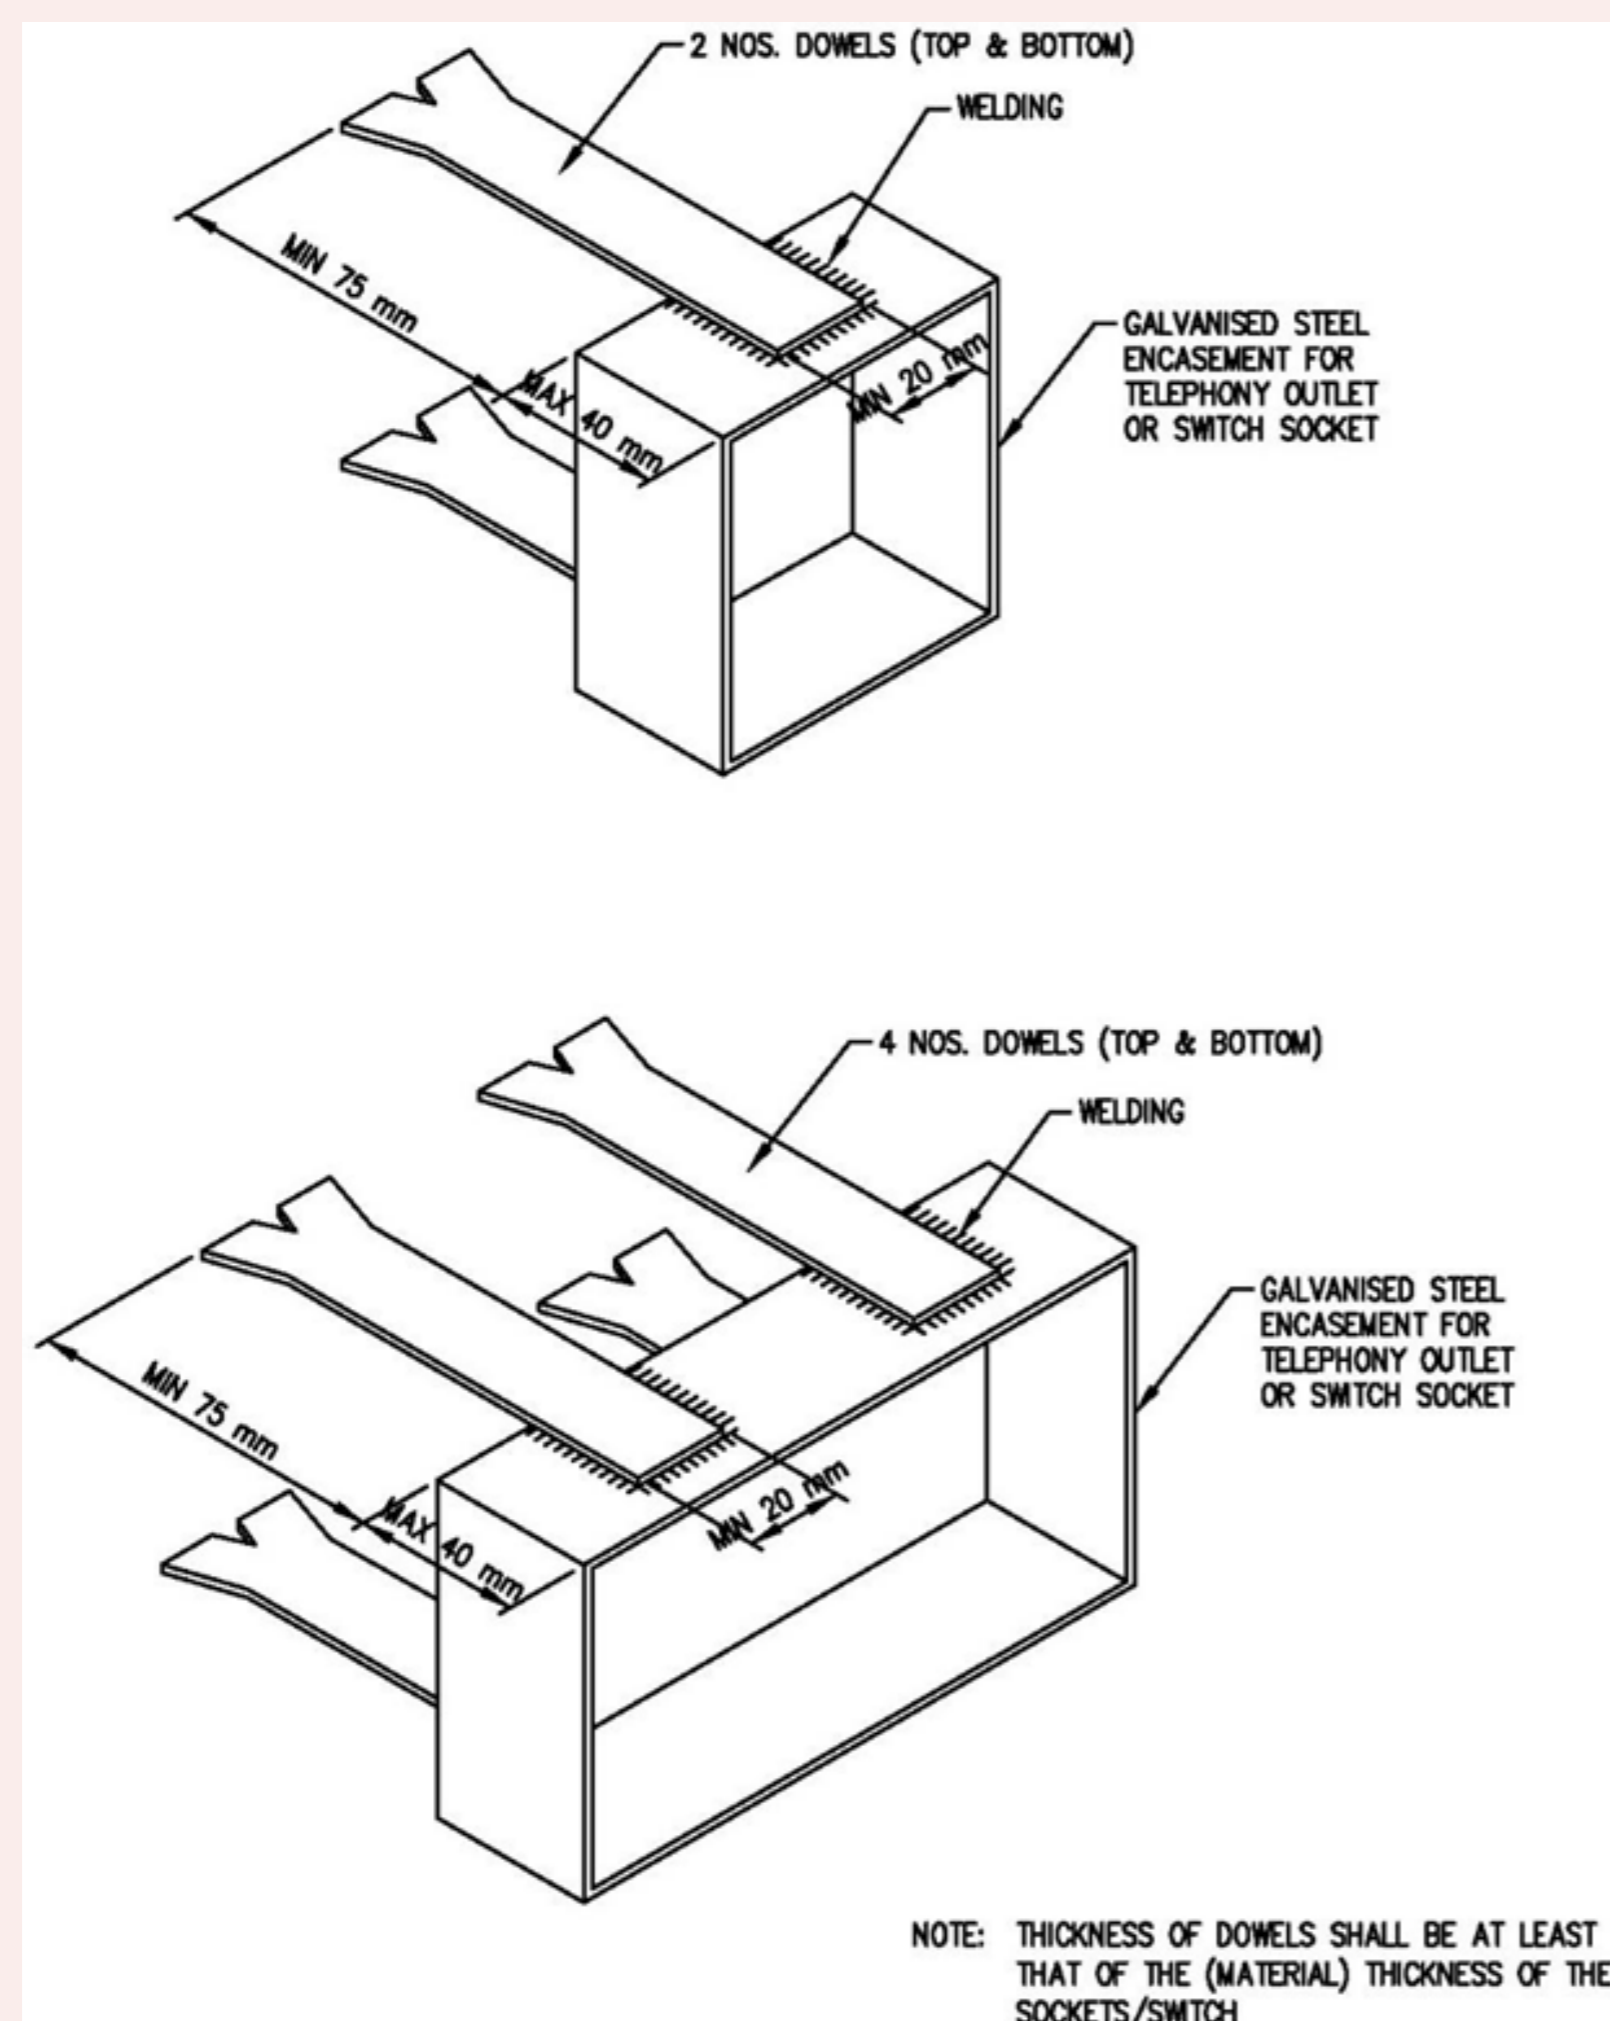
(b): TYPICAL DETAILS OF EMBEDDED SOCKET/SWITCH
